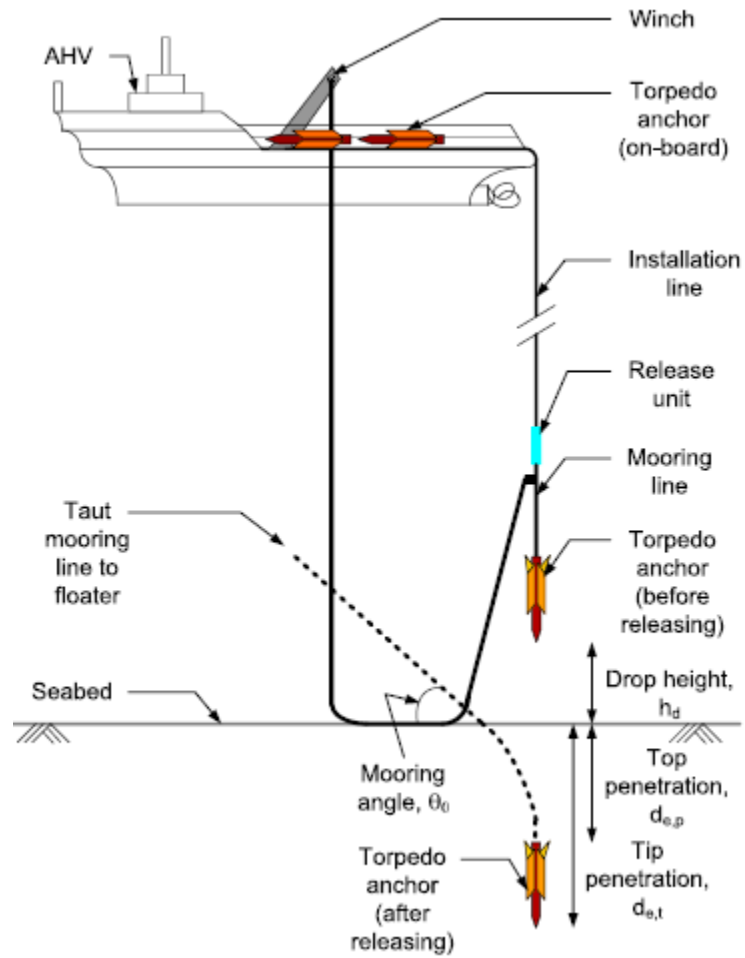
Torpedo Pile Installation (Hossain, 2014)
